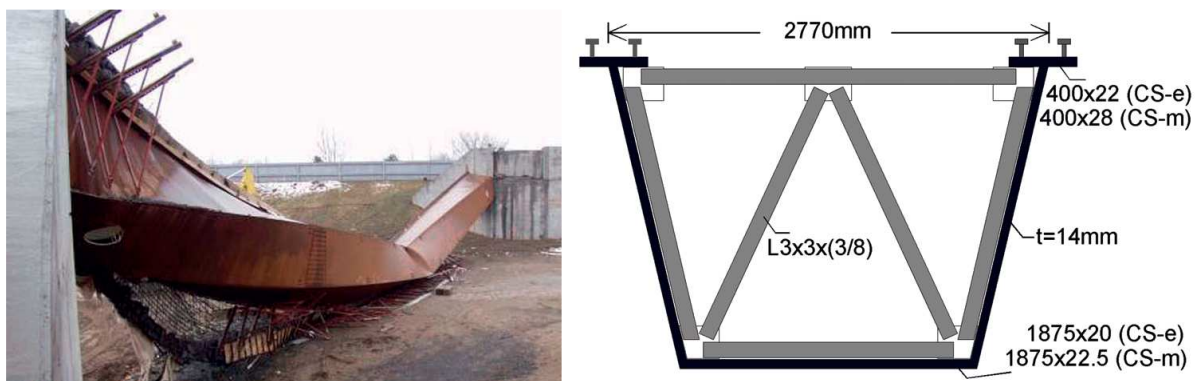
The Marcy Bridge in New York City that collapsed due to insufficient bracing when concreting of the bridge deck reached mid-span. a) A picture of the collapsed bridge. b) The cross section of the bridge. (Mehri et al. [12])
